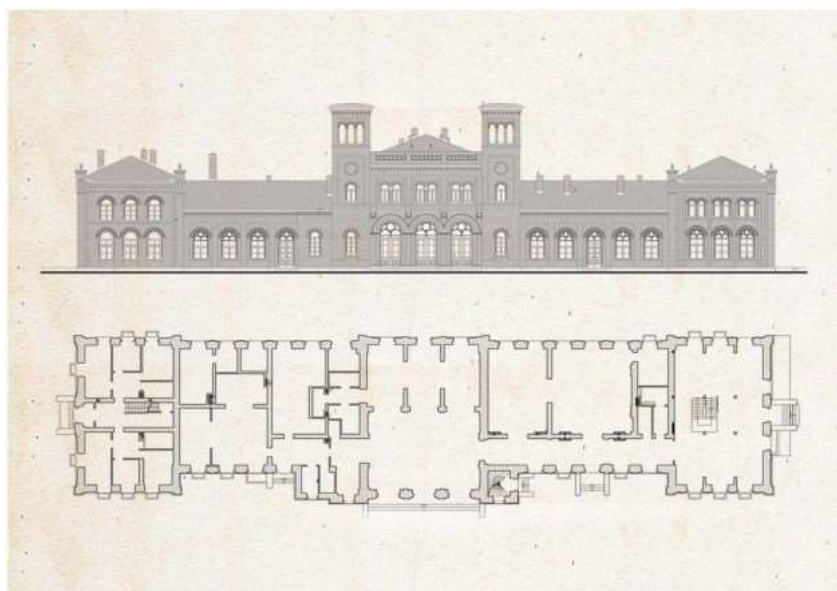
South-west elevation and ground floor plan, drawings DOMUS, author, 2011, [9]
